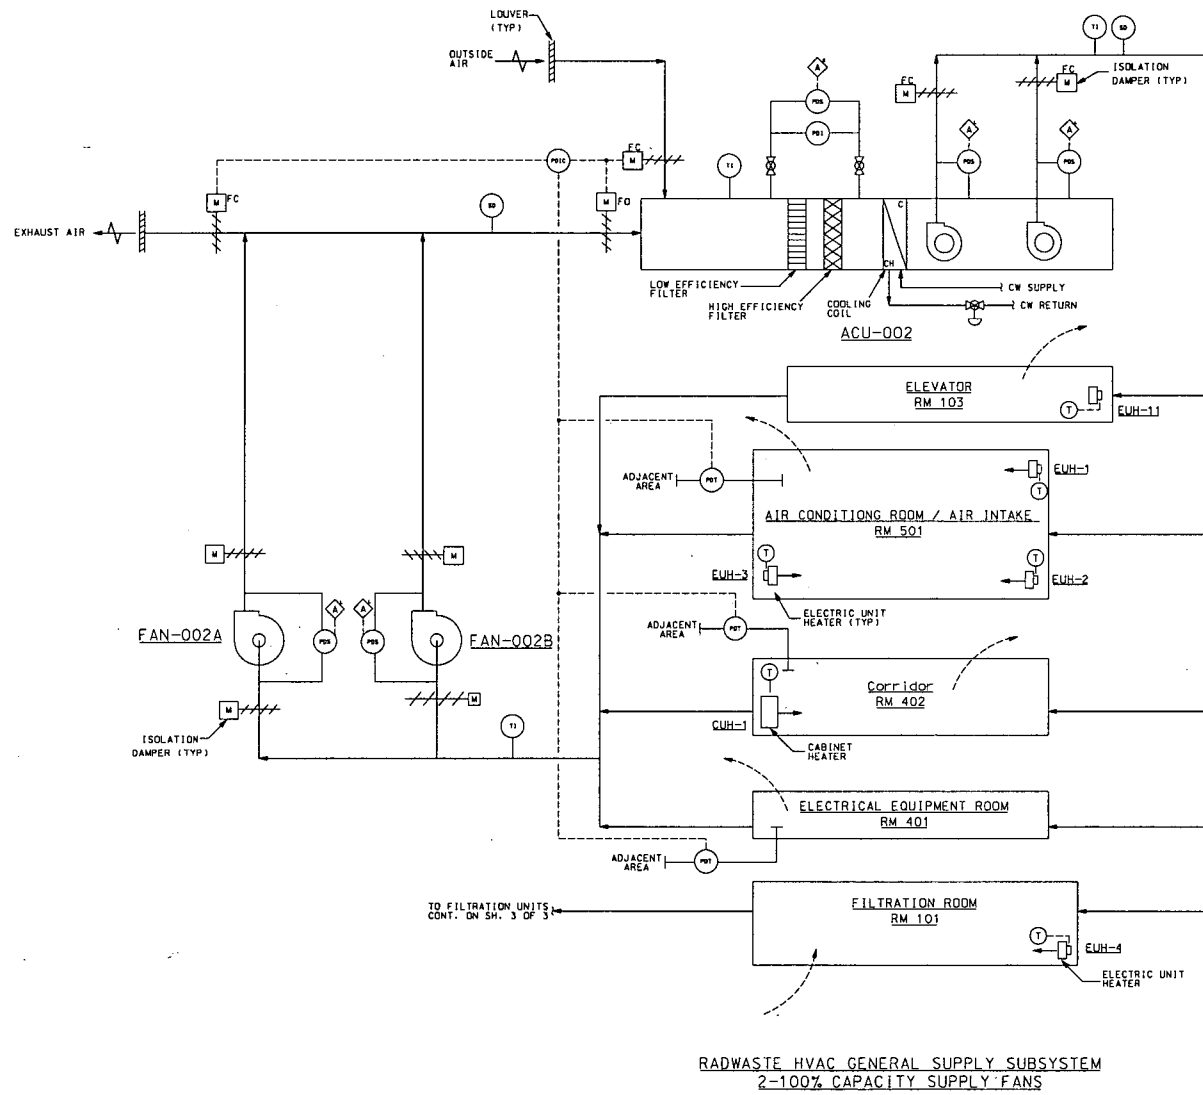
Radwaste Building HVAC P&ID (Sheet 2 of 3)
